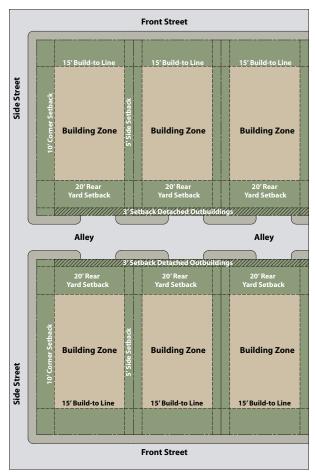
The building footprint may occupy any part of the building zone and build-to zone, subject to the maximum lot coverage limit.
